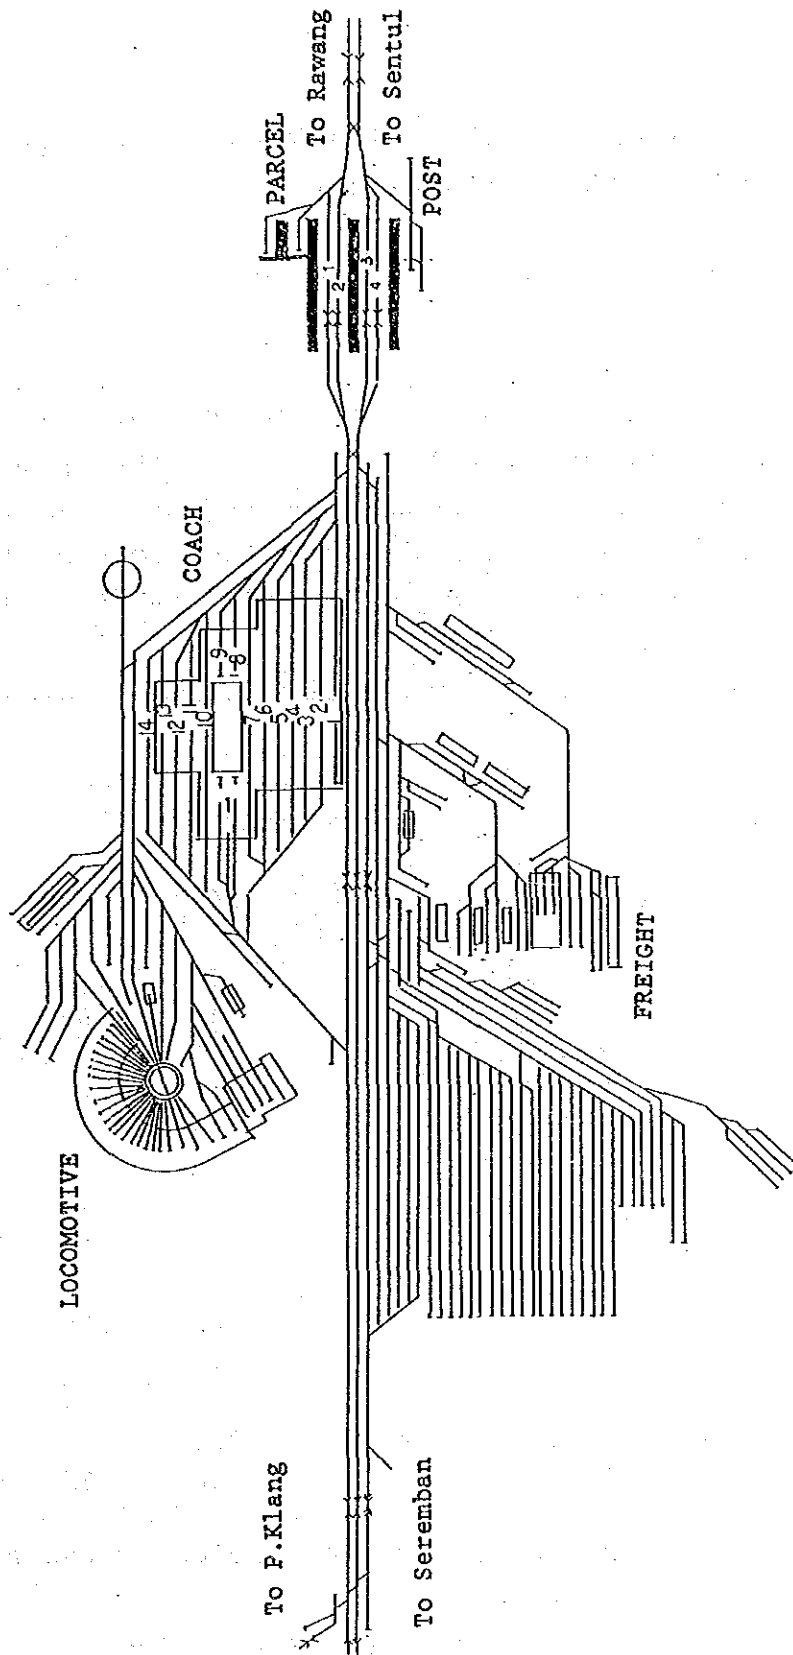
Existing Track Layout of Kuala Lumpur Station
